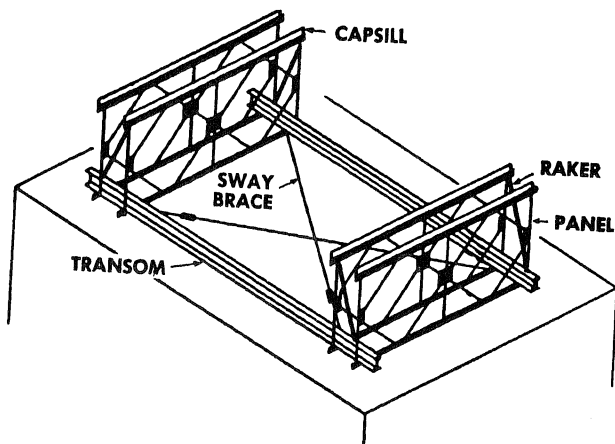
Panel crib pier, DS (1H) panel crib pier with panels horizontal.
